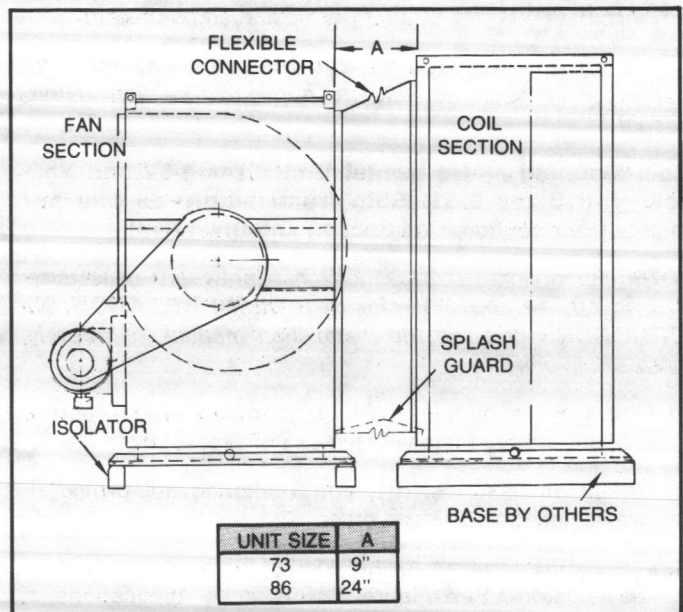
Mounting Clearance Dimensions for Draw-Thru Units Sizes 73-86
